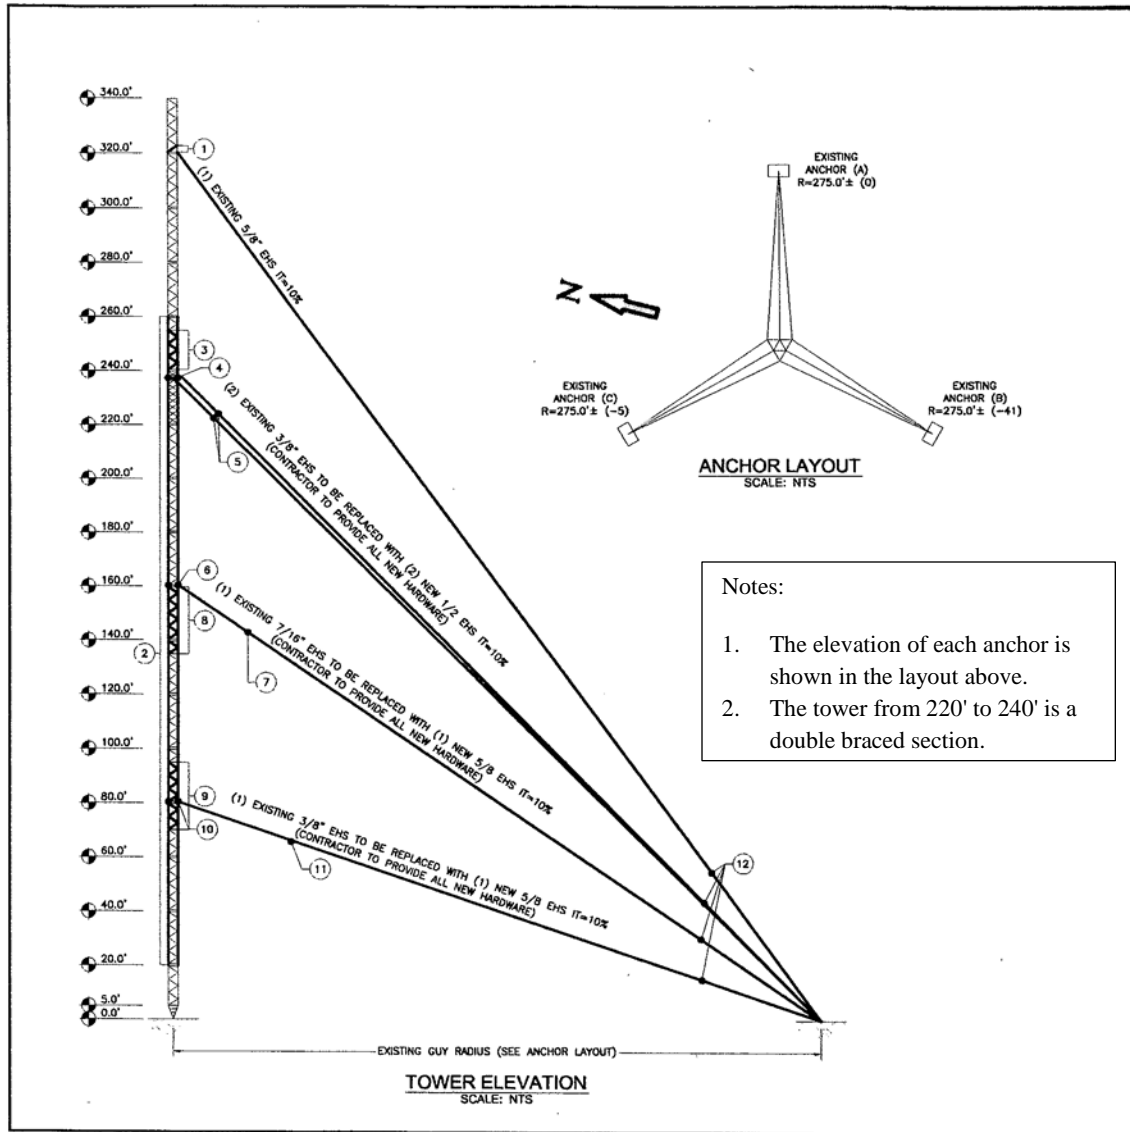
Plan and elevation of the cell tower and its anchors before the collapse (modified from the Modification Drawings, by FDH Engineering, Inc., August 2013).
